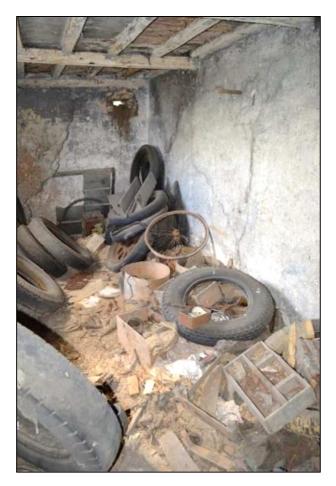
(Shot 82): Interior of Room 1e, showing plastered walls and ceiling and breather slit in south wall, looking south
